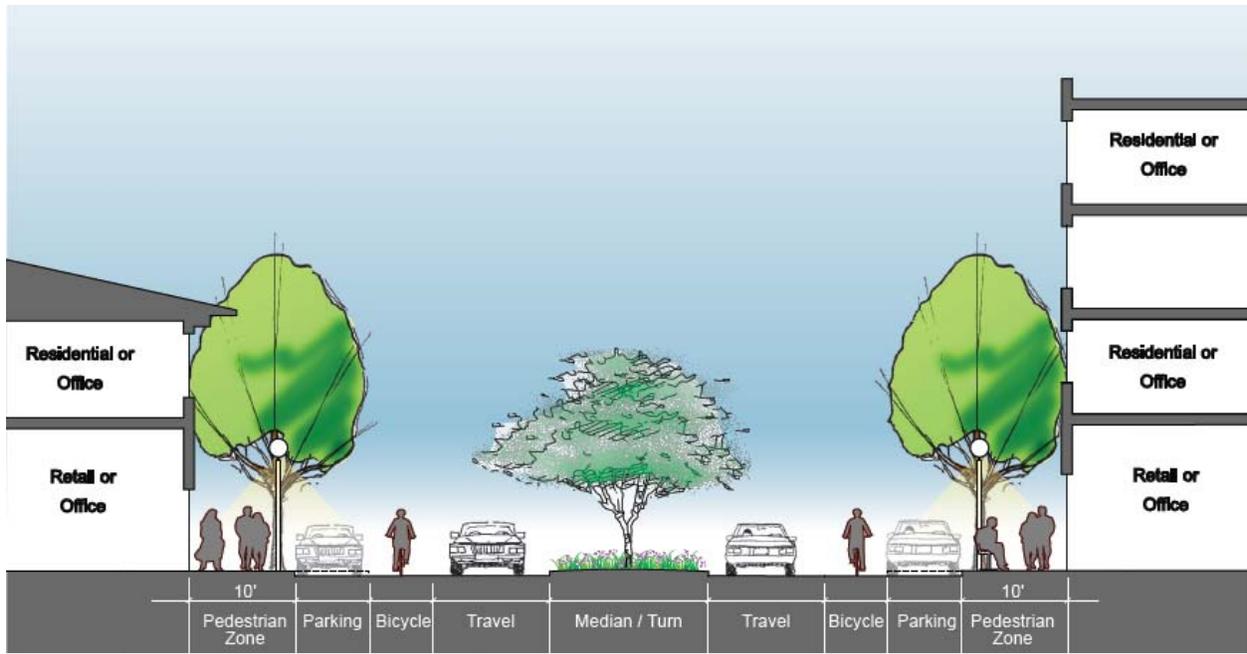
Elvas Avenue between J Street ramps and 65th Street
